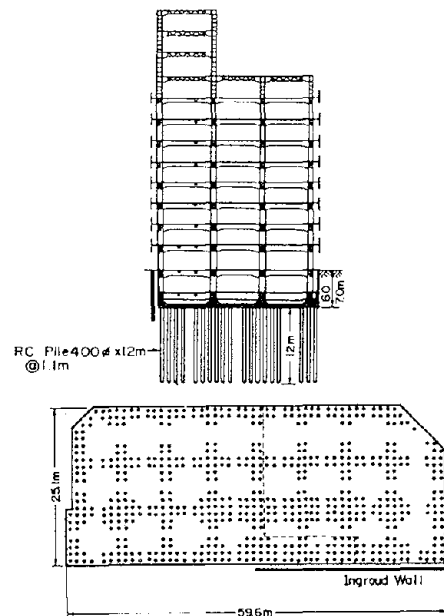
Outline of the Hokuriku-Building and Arrangement of Foundation Piles (Y.Yoshimi)⁵⁾
